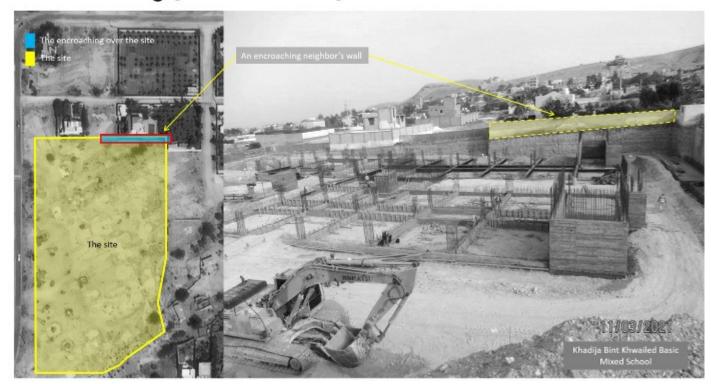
The problem has been SOIVED and a modified site plan drawings were issued
